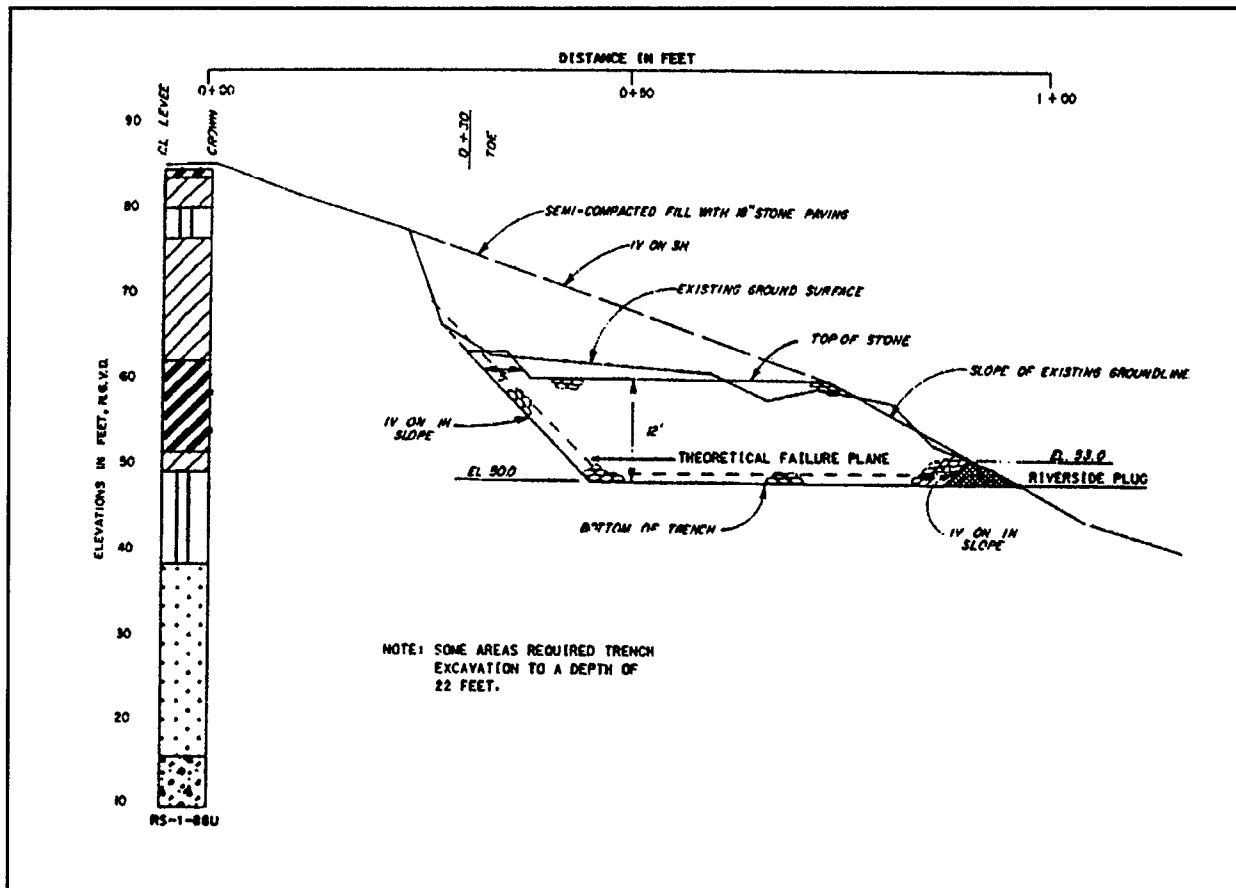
Section of slide area of stone-fill trenches used to stabilize levee on the Ouachita River at Rilla, LA, by USAED, Vicksburg, in 1988 (from Sills and Fleming 1994)
